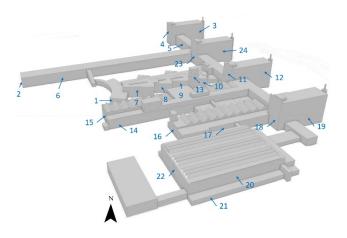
(left): 3mE building, roof FIDs Figure 64 (right): 3mE building, facade FIDs
